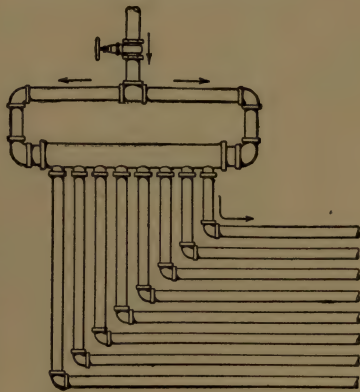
Proper method of making supply connections to "harp" coil of large size to insure supply of steam to each pipe in the coil.
